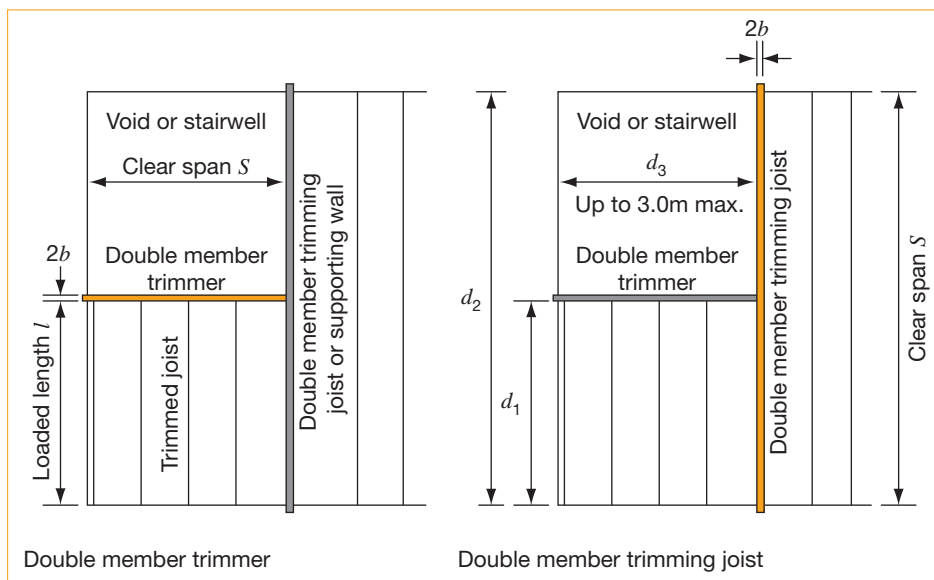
Plan showing dimensions for a trimmer and a trimming joist
